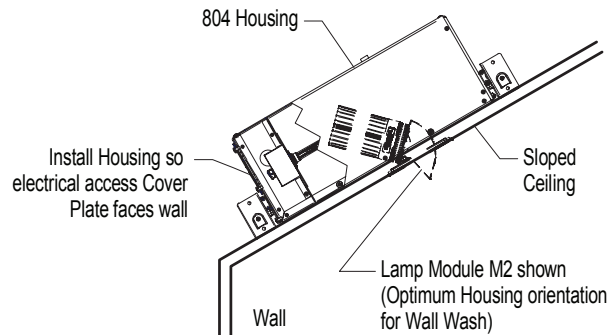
Recommended Sloped Ceiling Orientation (Model 804 shown)
